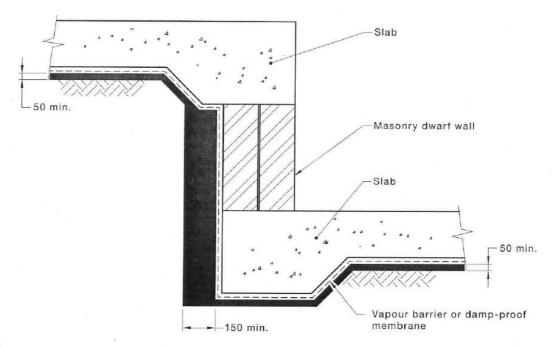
TYPICAL DETAILS FOR CHEMICAL UNDER-SLAB AND PERIMETER APPLICATION—FOOTING SLAB
